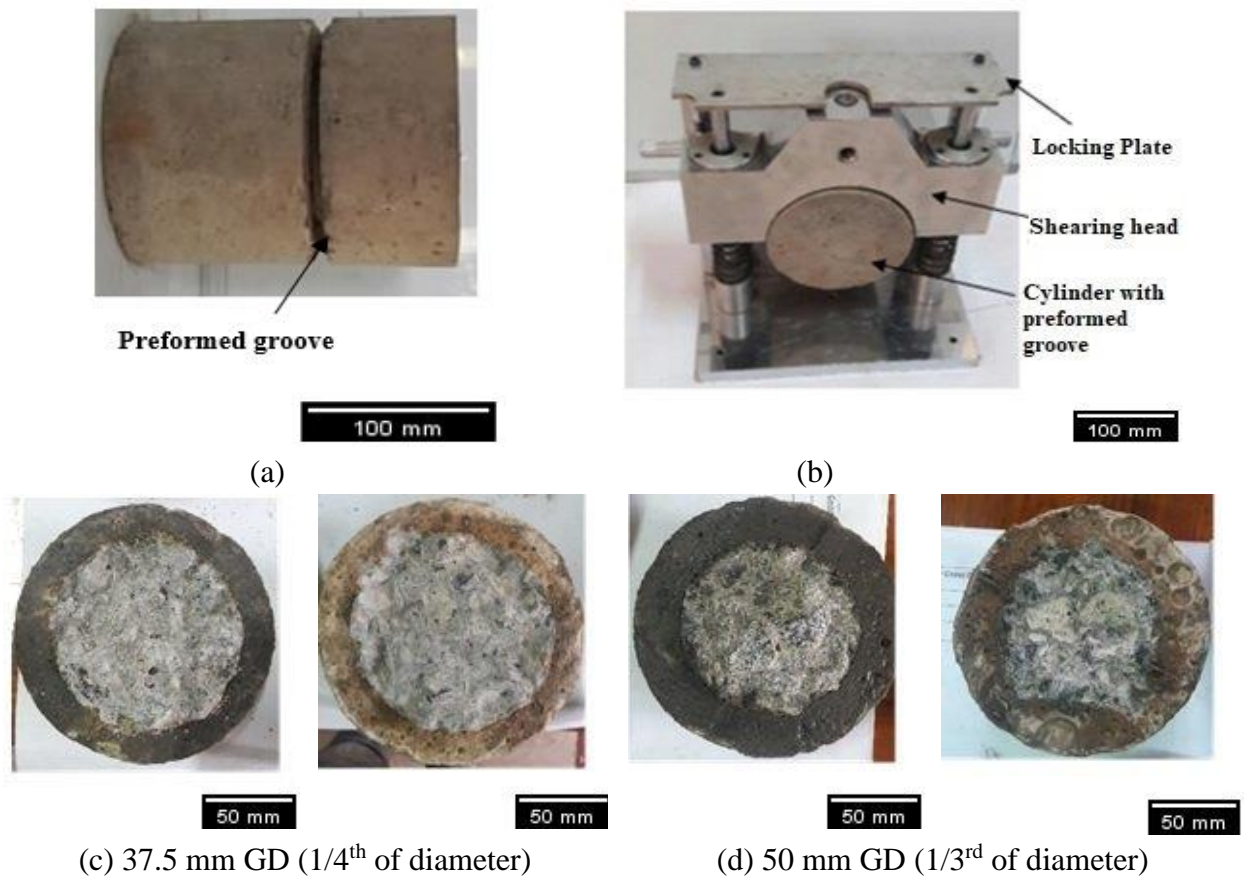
(a) Cylindrical concrete specimen, (b) Shear loading test setup, (c) and (d) failed plain PQC specimens
